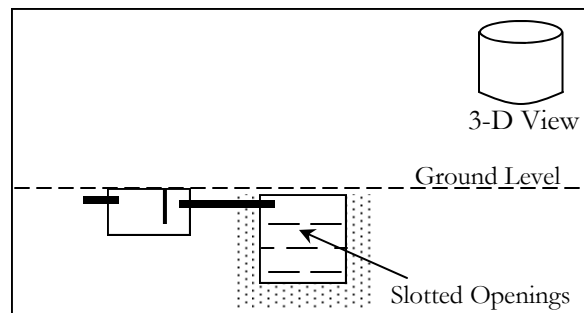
B. (Side View) Septic Tank and Precast Concrete Block-Trench System. Slotted openings in precast walls allow for wastewater release. Sized according to maximum septic tank release, infiltration rates, and soil conditions.
